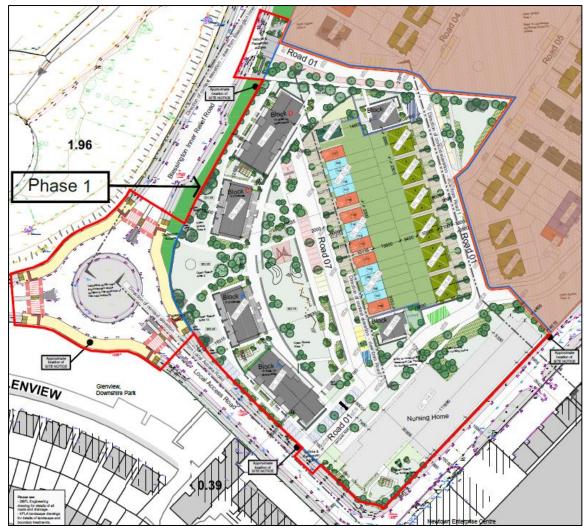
Site Layout Plan for Permitted Phase 1 development at the subject site
